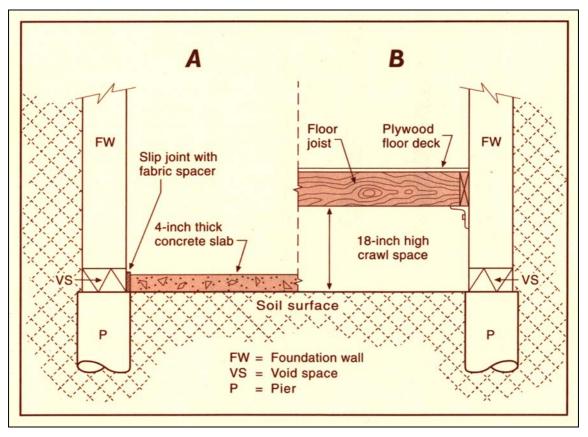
Two types of basement floor systems. (A) Floating slab floor. (B) Structural floor and crawl space. From Noe and others (1997).
